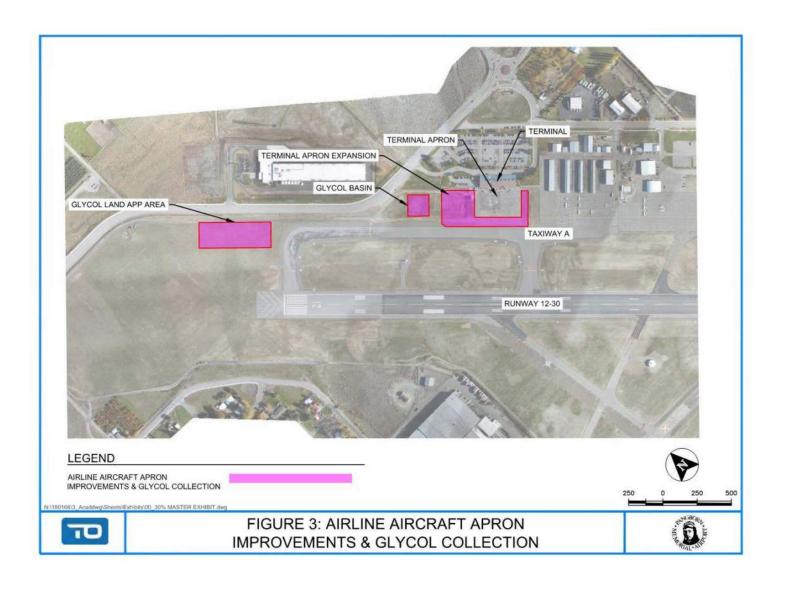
Airline Aircraft Apron Improvements & Glycol Collection, adapted from Proposed Improvements Exhibit, (dated 1/29/21)
